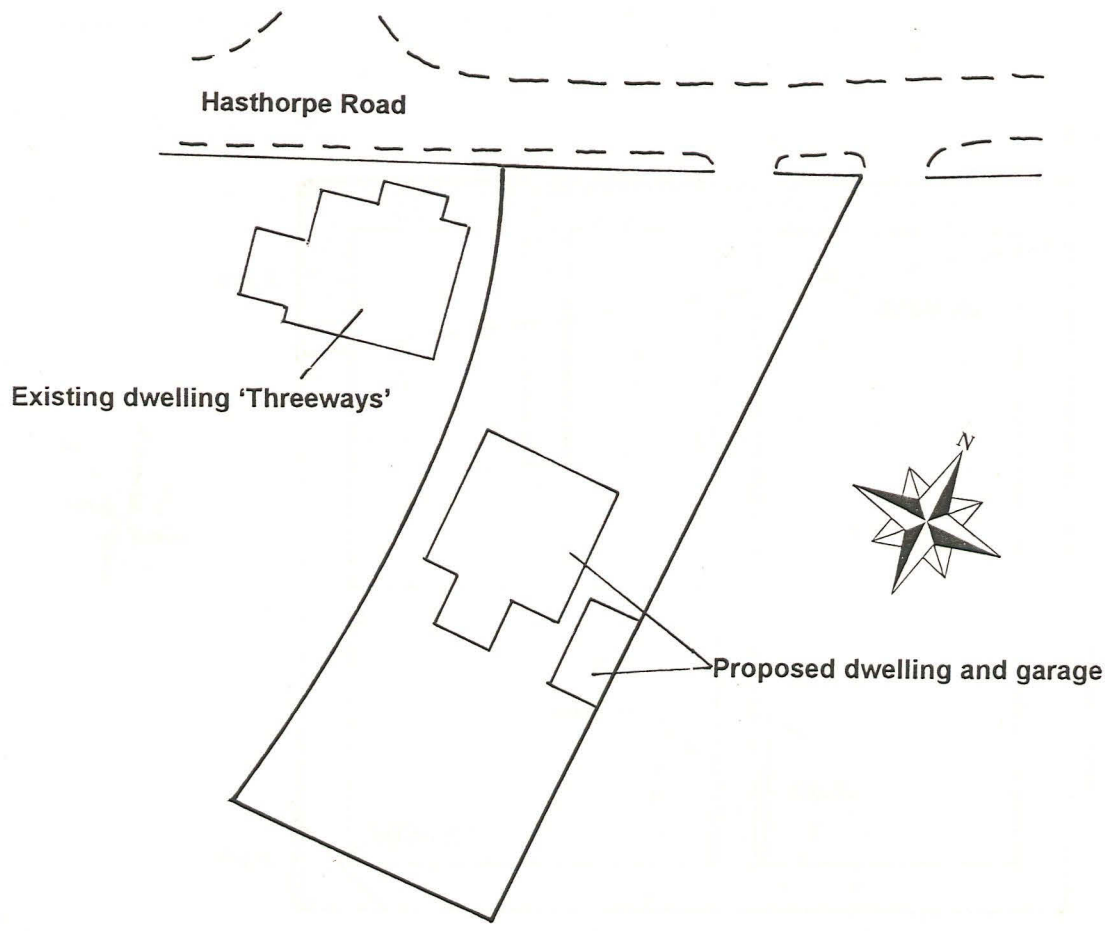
Plan of the site showing the location of the proposed dwelling and garage.
